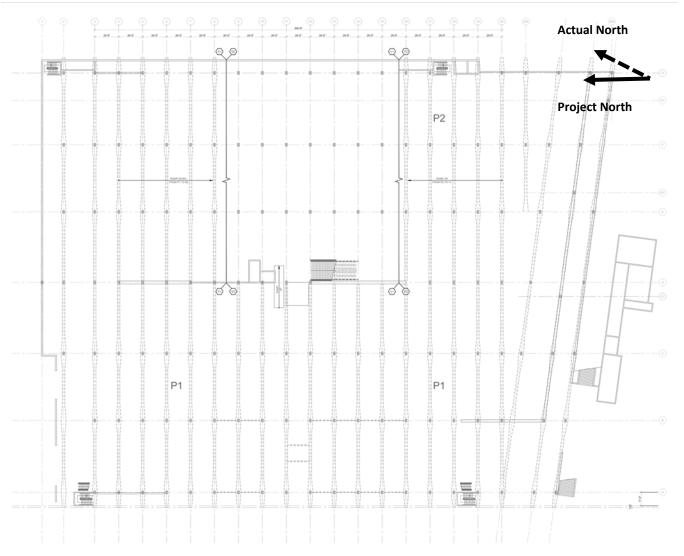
Partial Upper Pier and Lower Village Levels, South Pier Parking Structure
